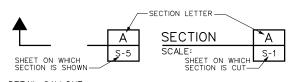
DETAILS ON GS SHEETS ARE PART OF MWH'S STRUCTURAL STANDARD DETAILS.
